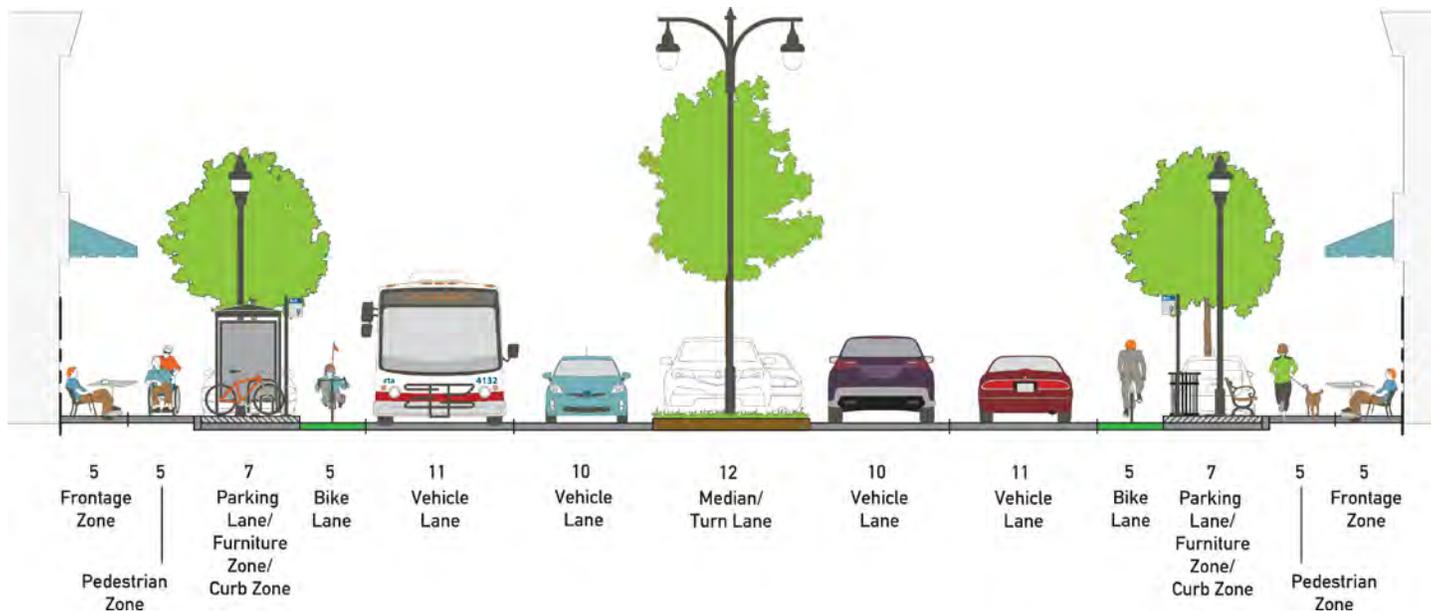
Typical Cross-Section for a Urban Commercial Mixed Use Boulevard
